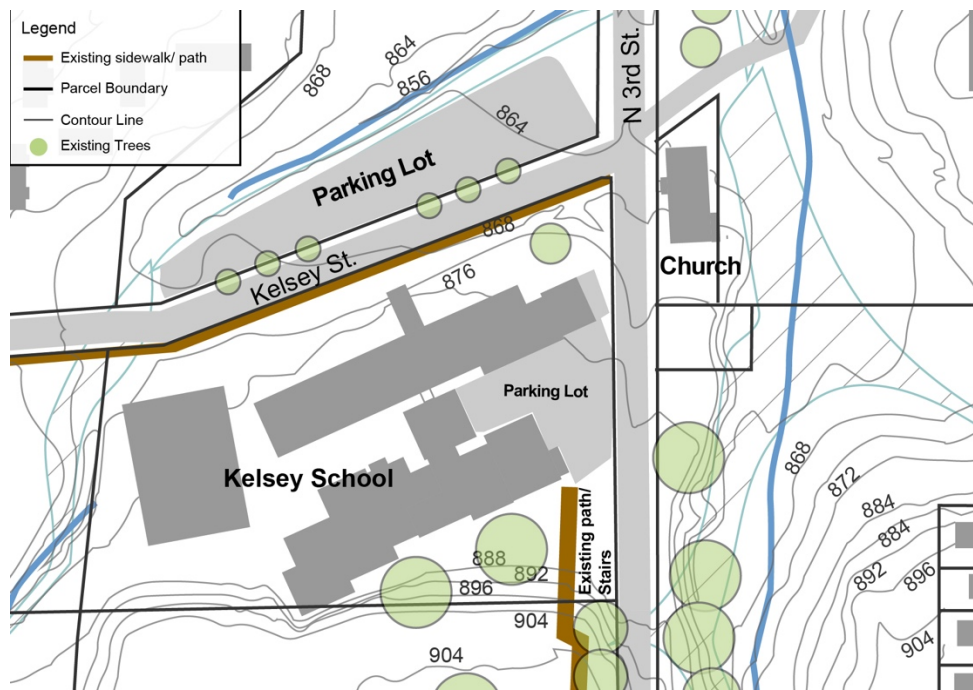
Street Segment 3 – Existing conditions (By author)
